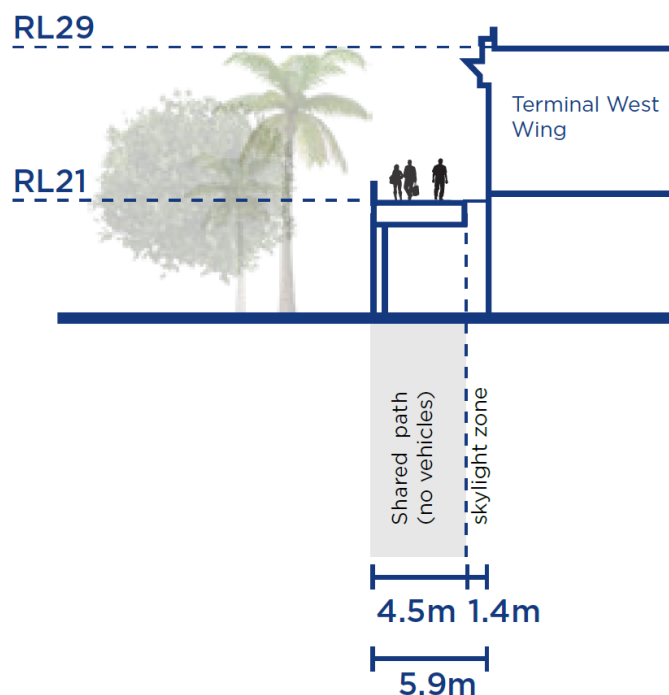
Typical cross-section 12, Cleveland Street connection to OSD deck
